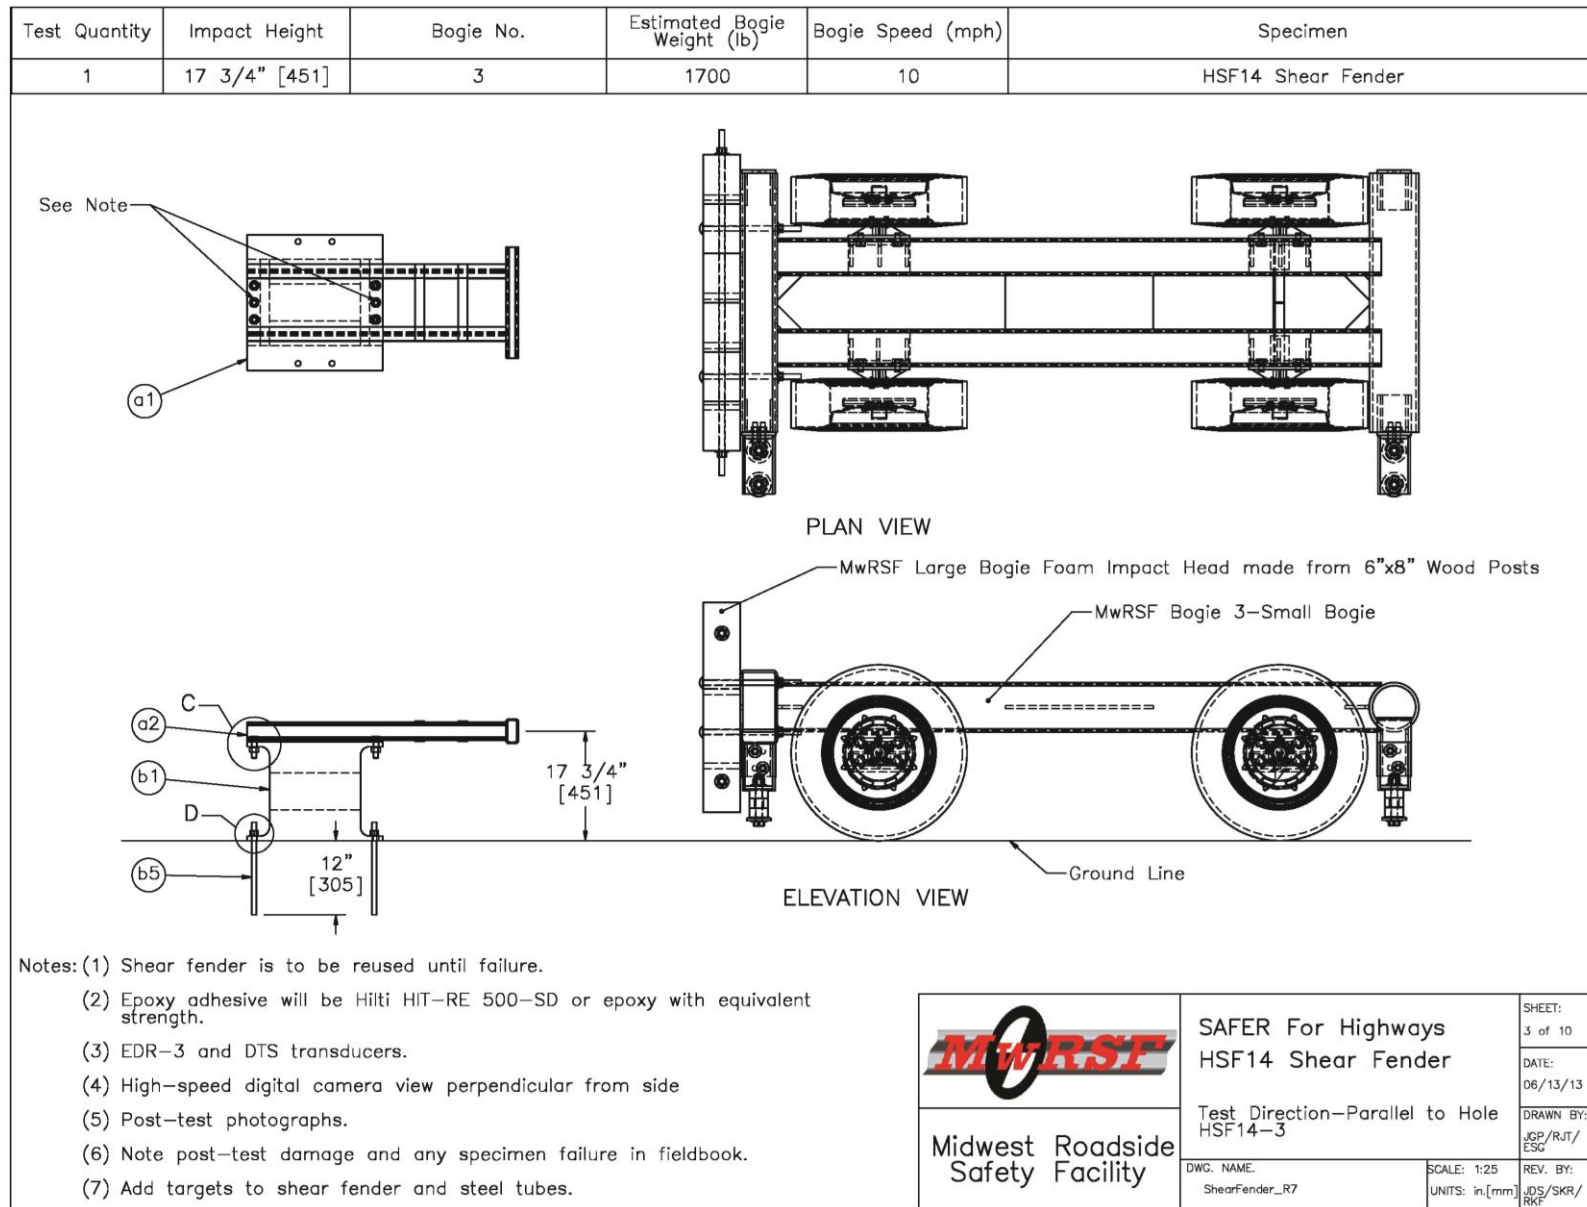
Bogie Testing Setup – Parallel to Hole, Test No. HSF14-3
